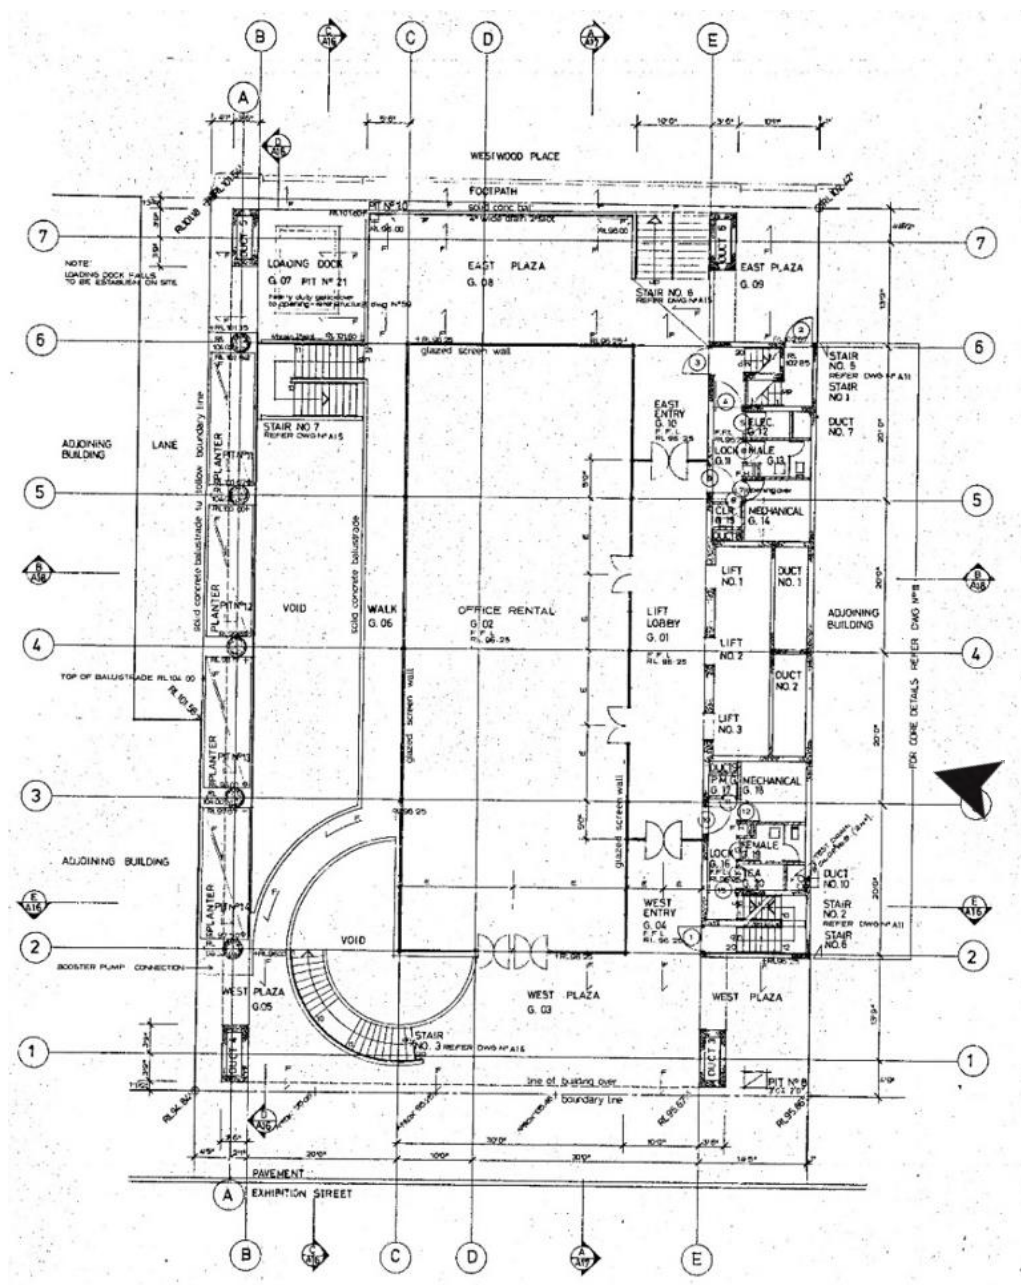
Detailed ground floor plan, dated 1975 (BAP).
